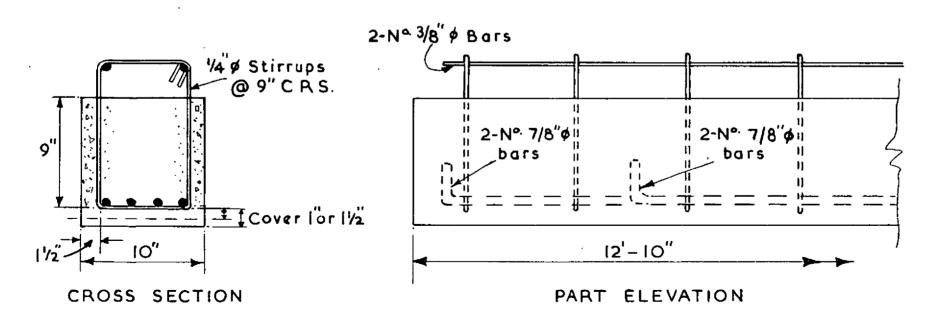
ARRANGEMENT OF PRESTRESSED & R.C. FLOORS FOR TEST
